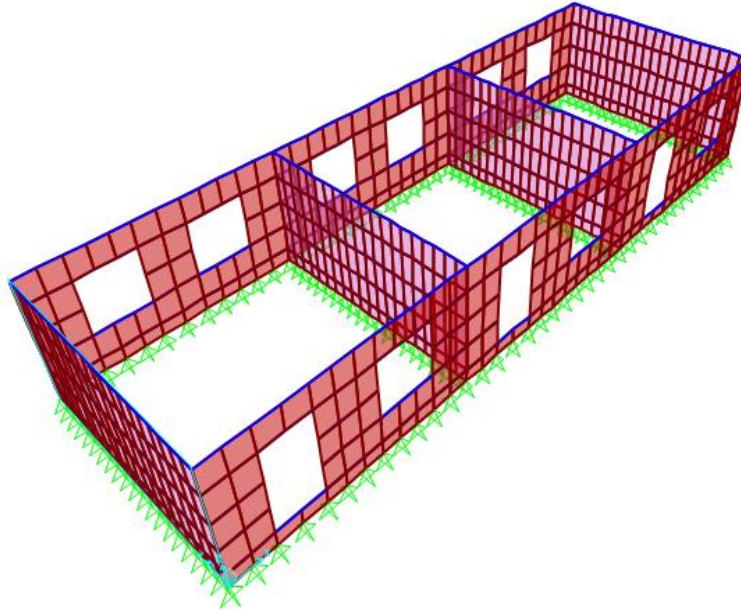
School PL model 3D view: Door wall (front); Window wall (back)
